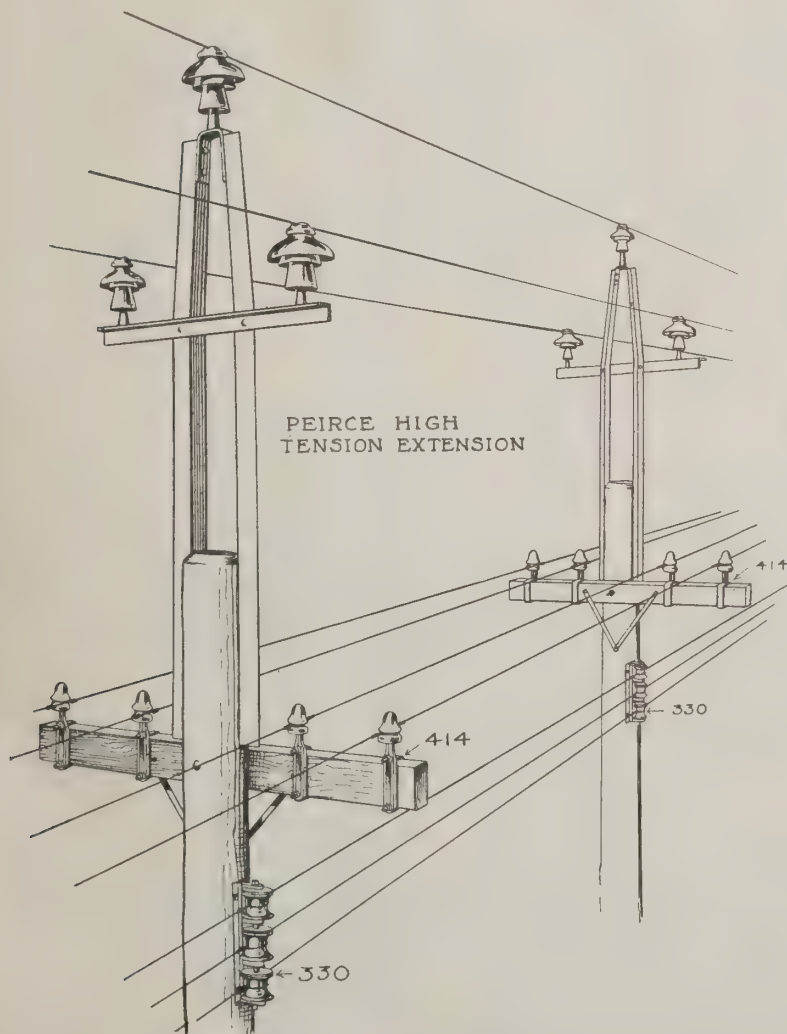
Arrangement for Making High Tension Extension to Existing Pole Line. Design by Hubbard and Company, Pittsburgh, Pa.
